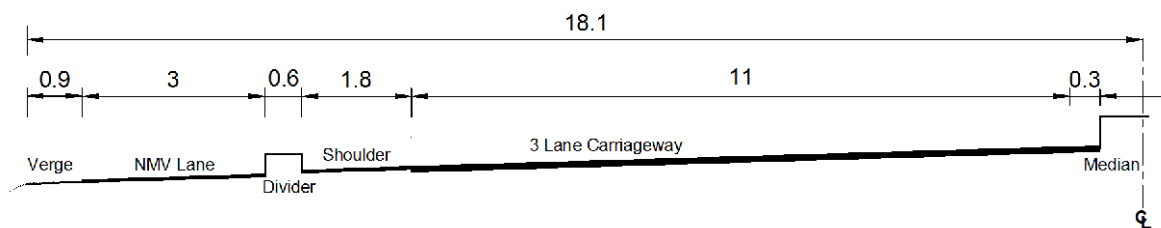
Typical Cross-Section of Road Proposed by Geometric Design Standard (RHD)
